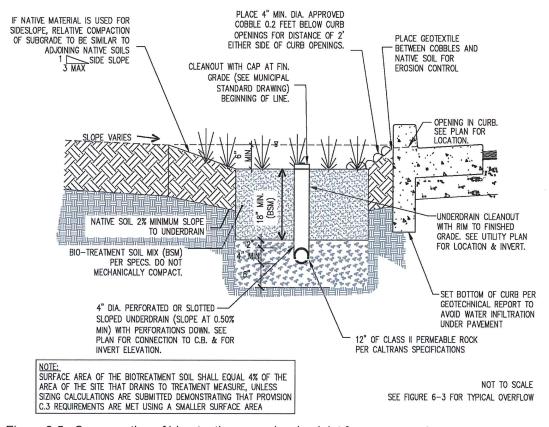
Cross section of bioretention area showing inlet from pavement.
